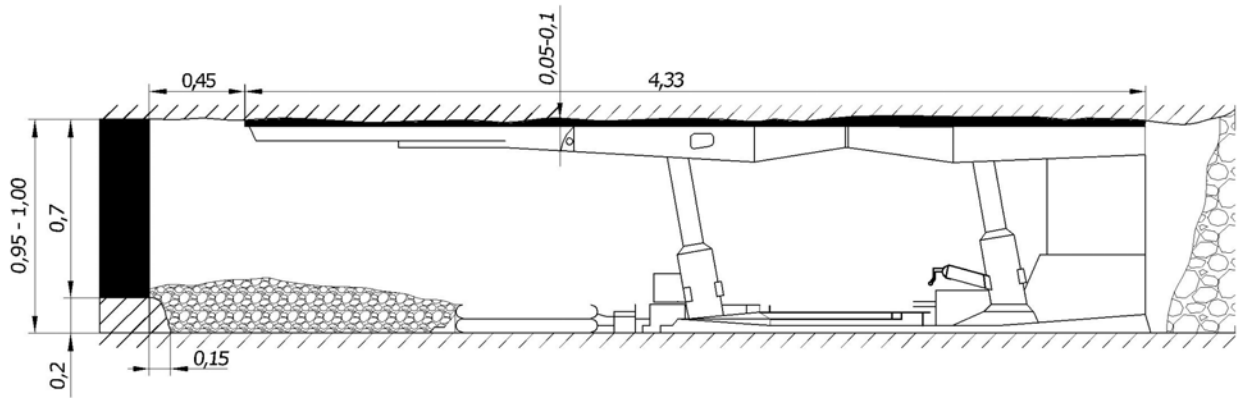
A view of a longwall equipped with 1KM103 powered system after coal seam has been extracted, and undercut floor rocks have been cut
